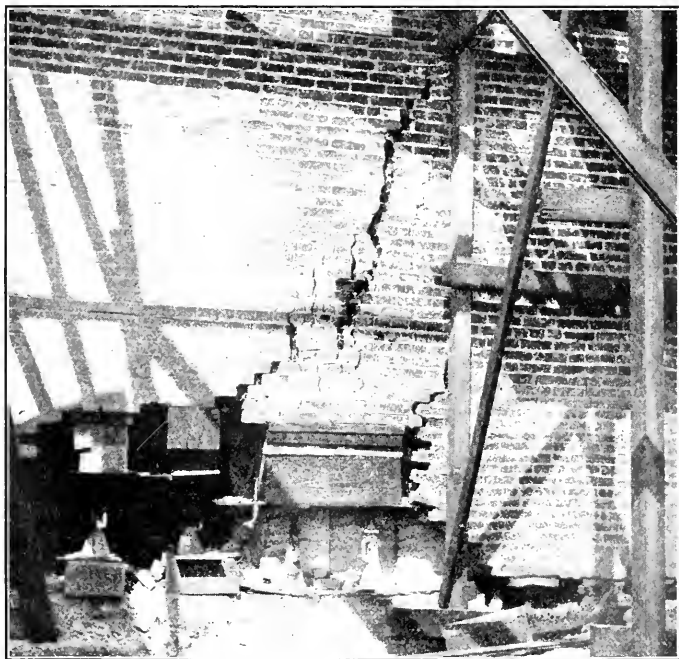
CRACK IN WALL OF BUILDING CAUSED BY TENDENCY OF BLOCKING TO ROLL.
